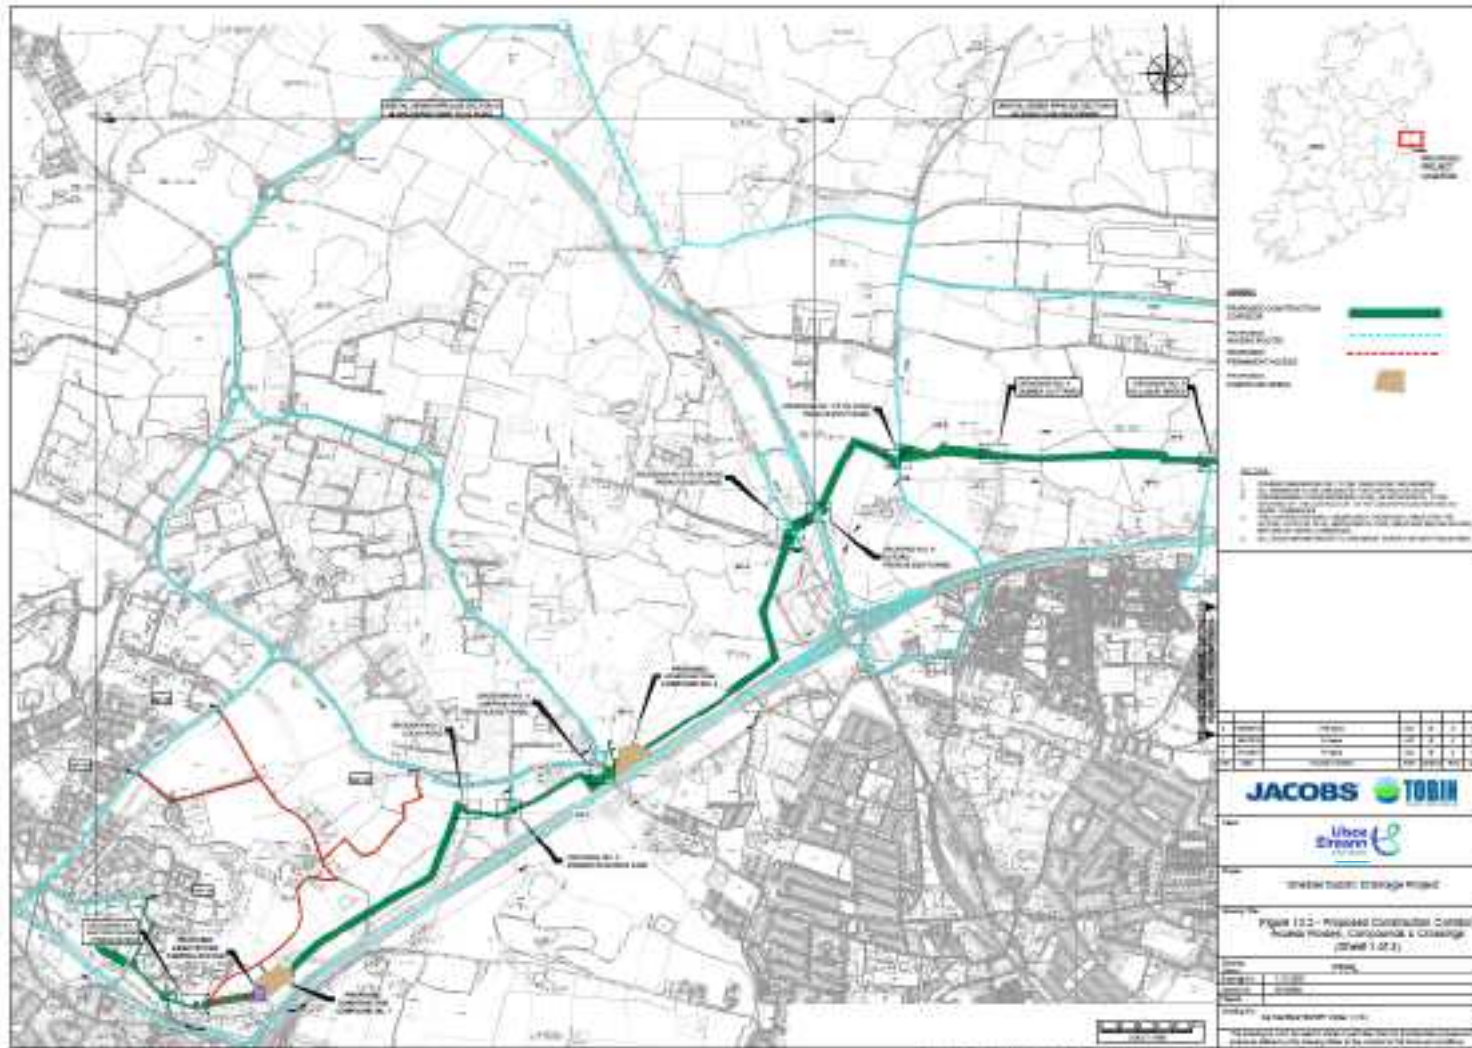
Proposed Construction Corridor, Access Routes, Compounds & Crossings, Sheet (1-3)
